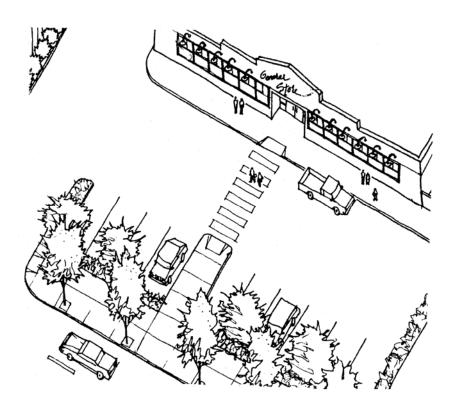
Provide a safe, accessible pedestrian route from the street to the building entry.
